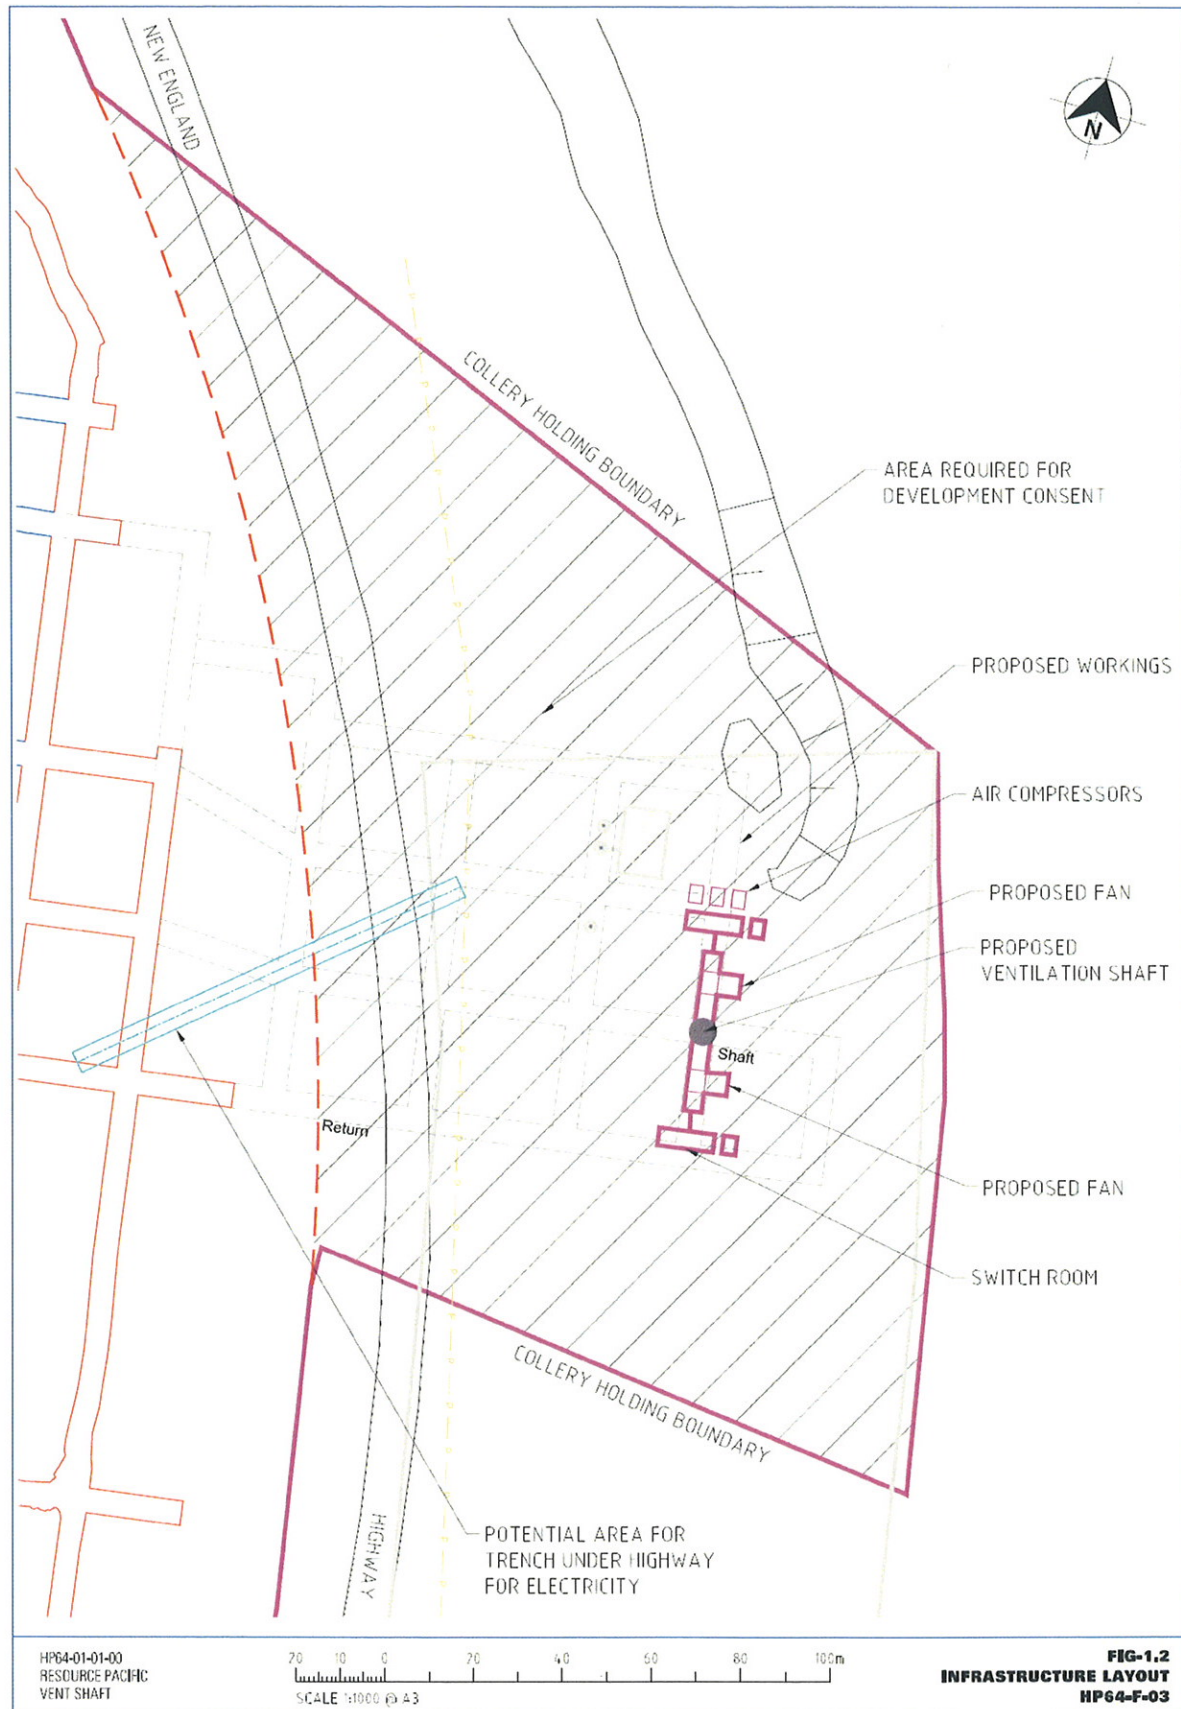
Proposed infrastructure layout and extension of Colliery Holding
